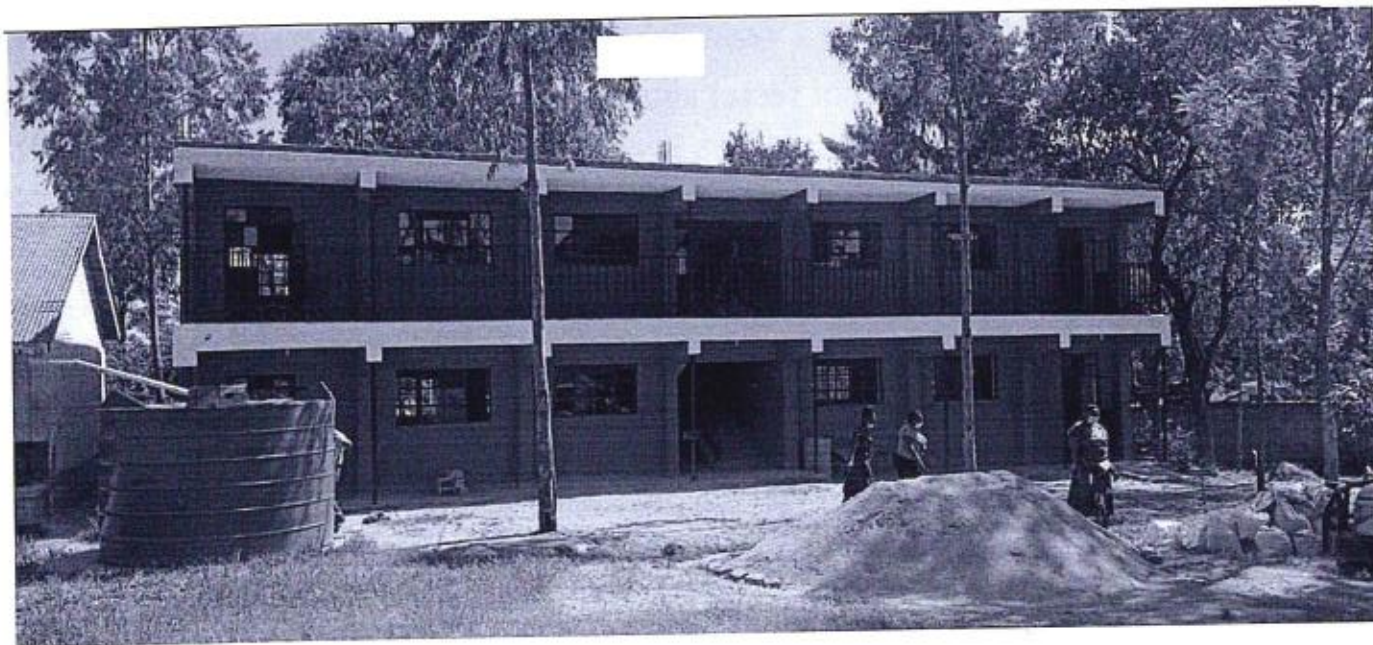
Construction of 8 no classrooms at St. Dominic Bukna Secondary School.
